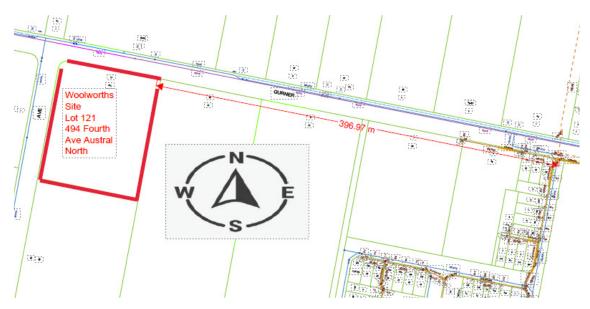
Option 1. Potential receiving sewers, approx. 7.75m deep, 400m to the East of Site
